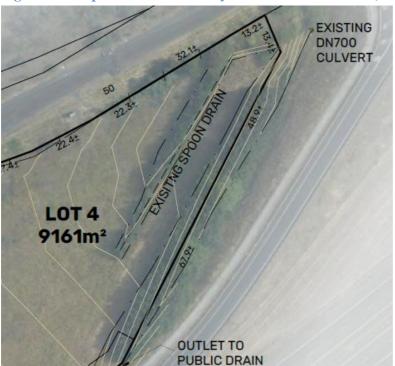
Proposed subdivision layout at 80 Possum Road, Bridgewater
